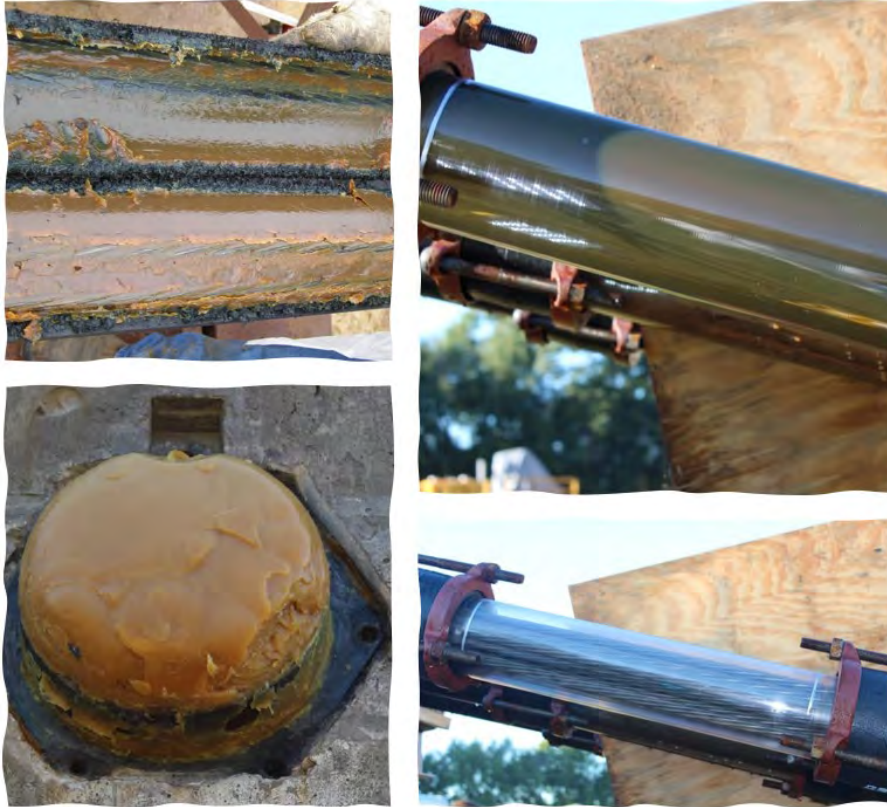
Images of the wax-filled tendons, including clear housing, cross-section, and an anchor point. (Source: FDOT)
